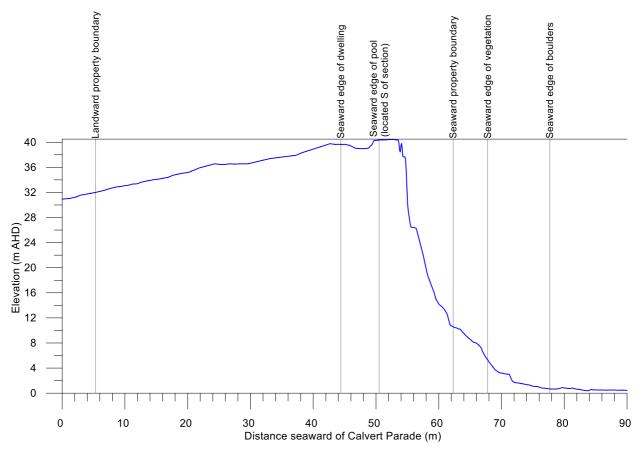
Section A through site (including cliff face) and down to adjacent rock platform
